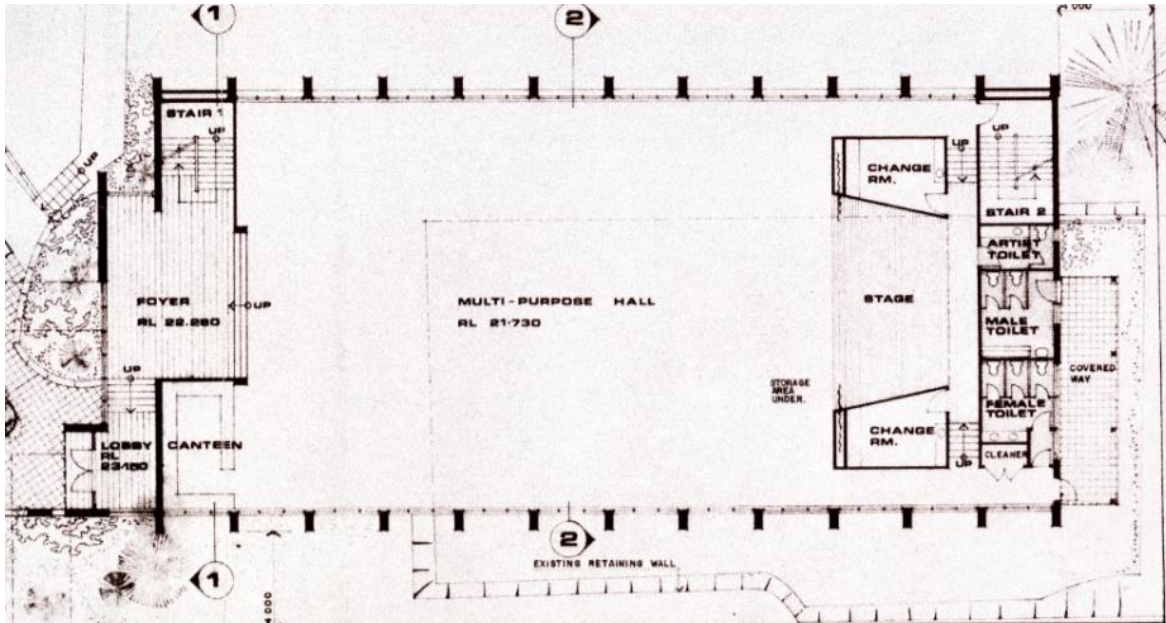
Floor plan of the original building showing the original multipurpose hall with windows along the north and south sides, and flat floor. (Source: 'Loreto Kirribilli Building Project 1980', sourced from the school's archives)
